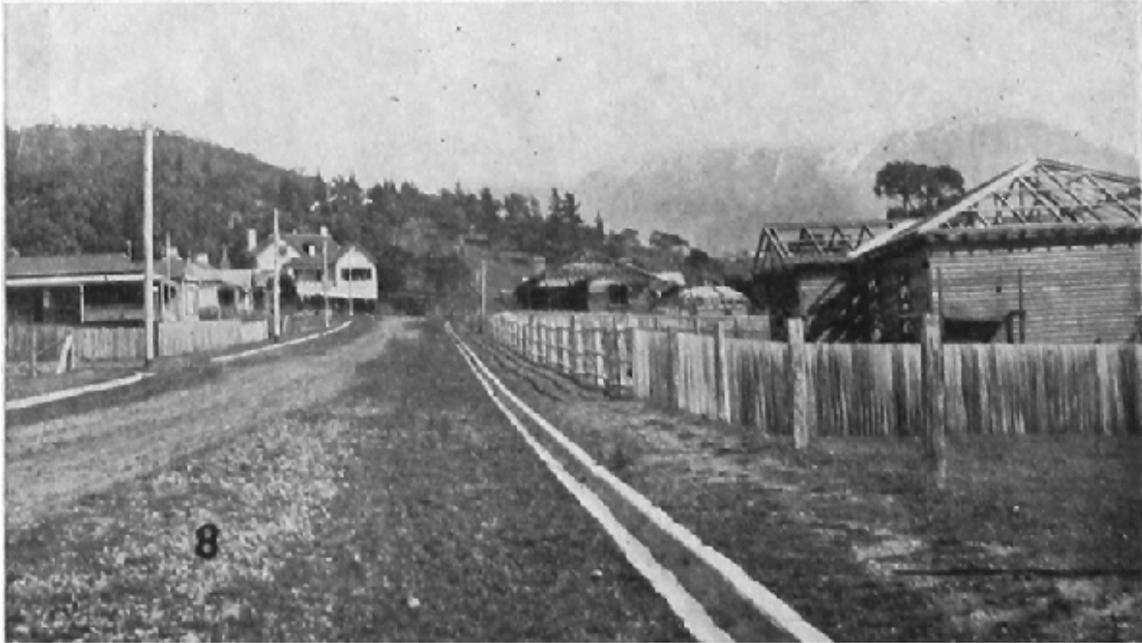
View Street, Sandy Bay, looking towards Proctor's Road, showing 7 new houses under construction
